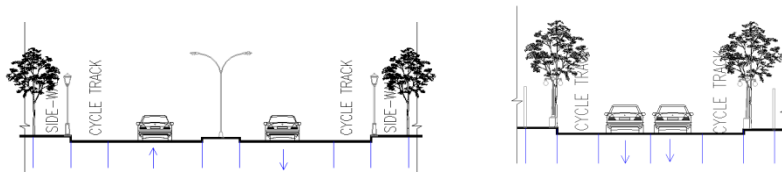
& 31 : Proposed Major & Local Street (Source: Author)
